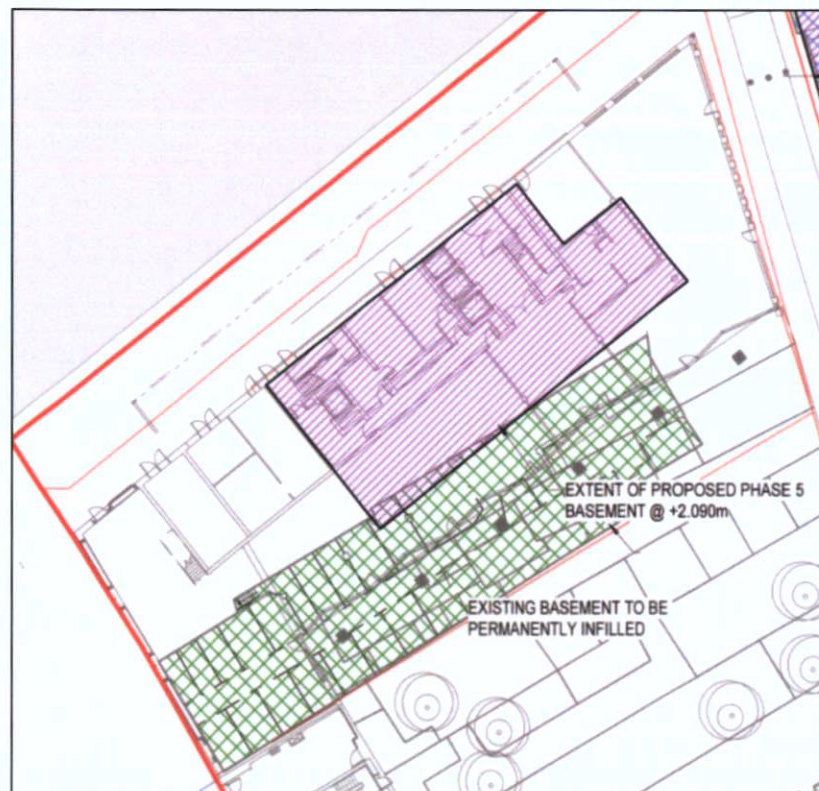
Existing basement beneath No. 22 and 23 Moore Street backfilled permanently (green) and proposed basement (pink) in Site 5.
